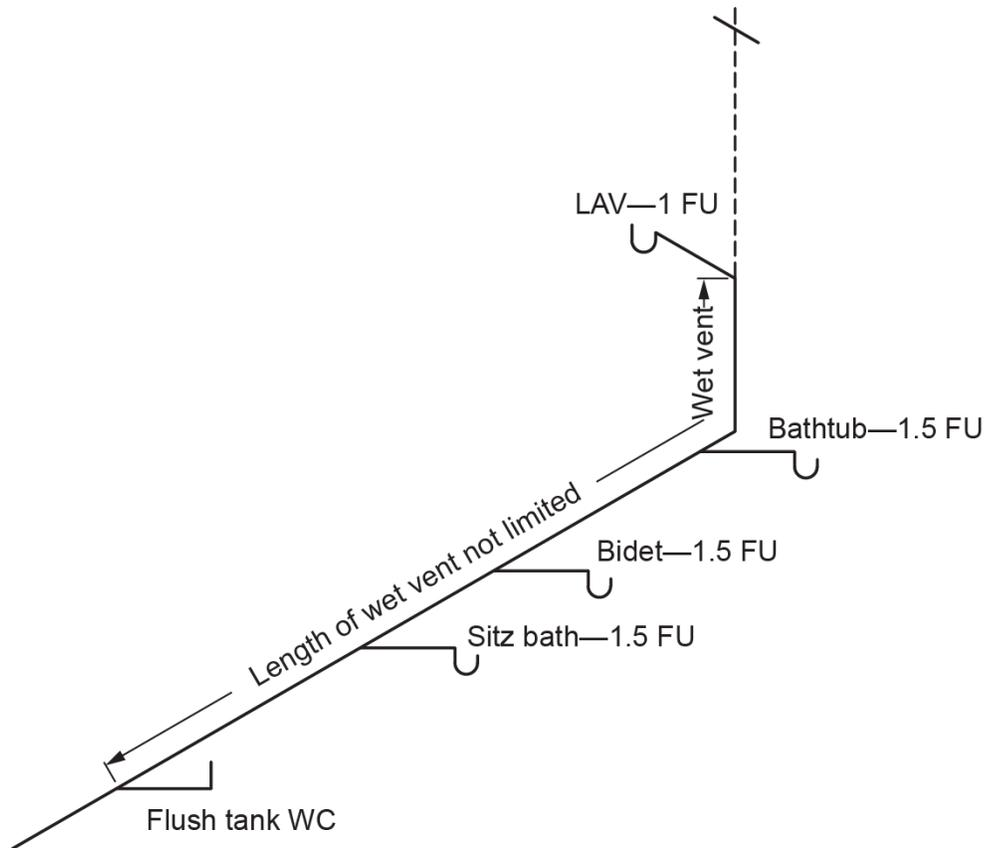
The hydraulic load when a separately vented fixture is connected to the trap arm of a wet-vented water closet. (Skilled Trades BC, 2021) Used with permission.
